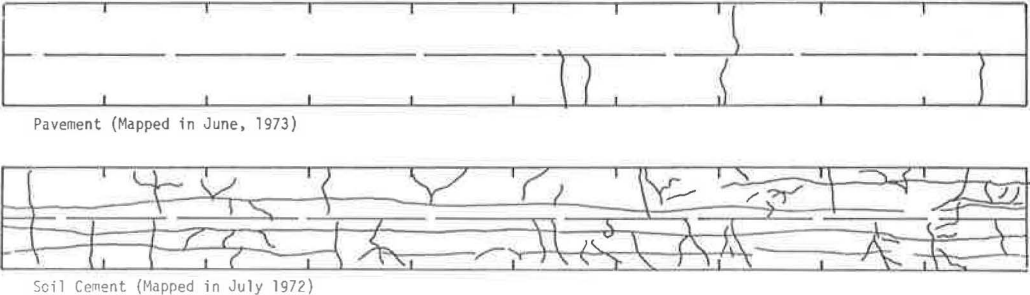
Cracking pattern of soil-cement base and superimposed pavement for experimental section with less cement content.
